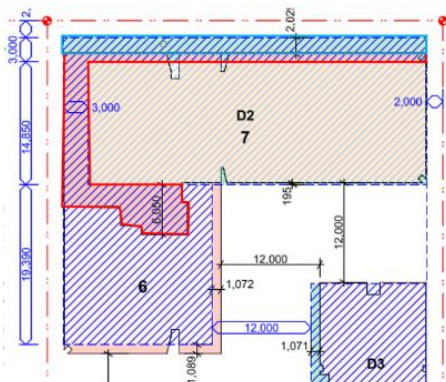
Plan of Building D2, with DCP height exceedance outlined in red
